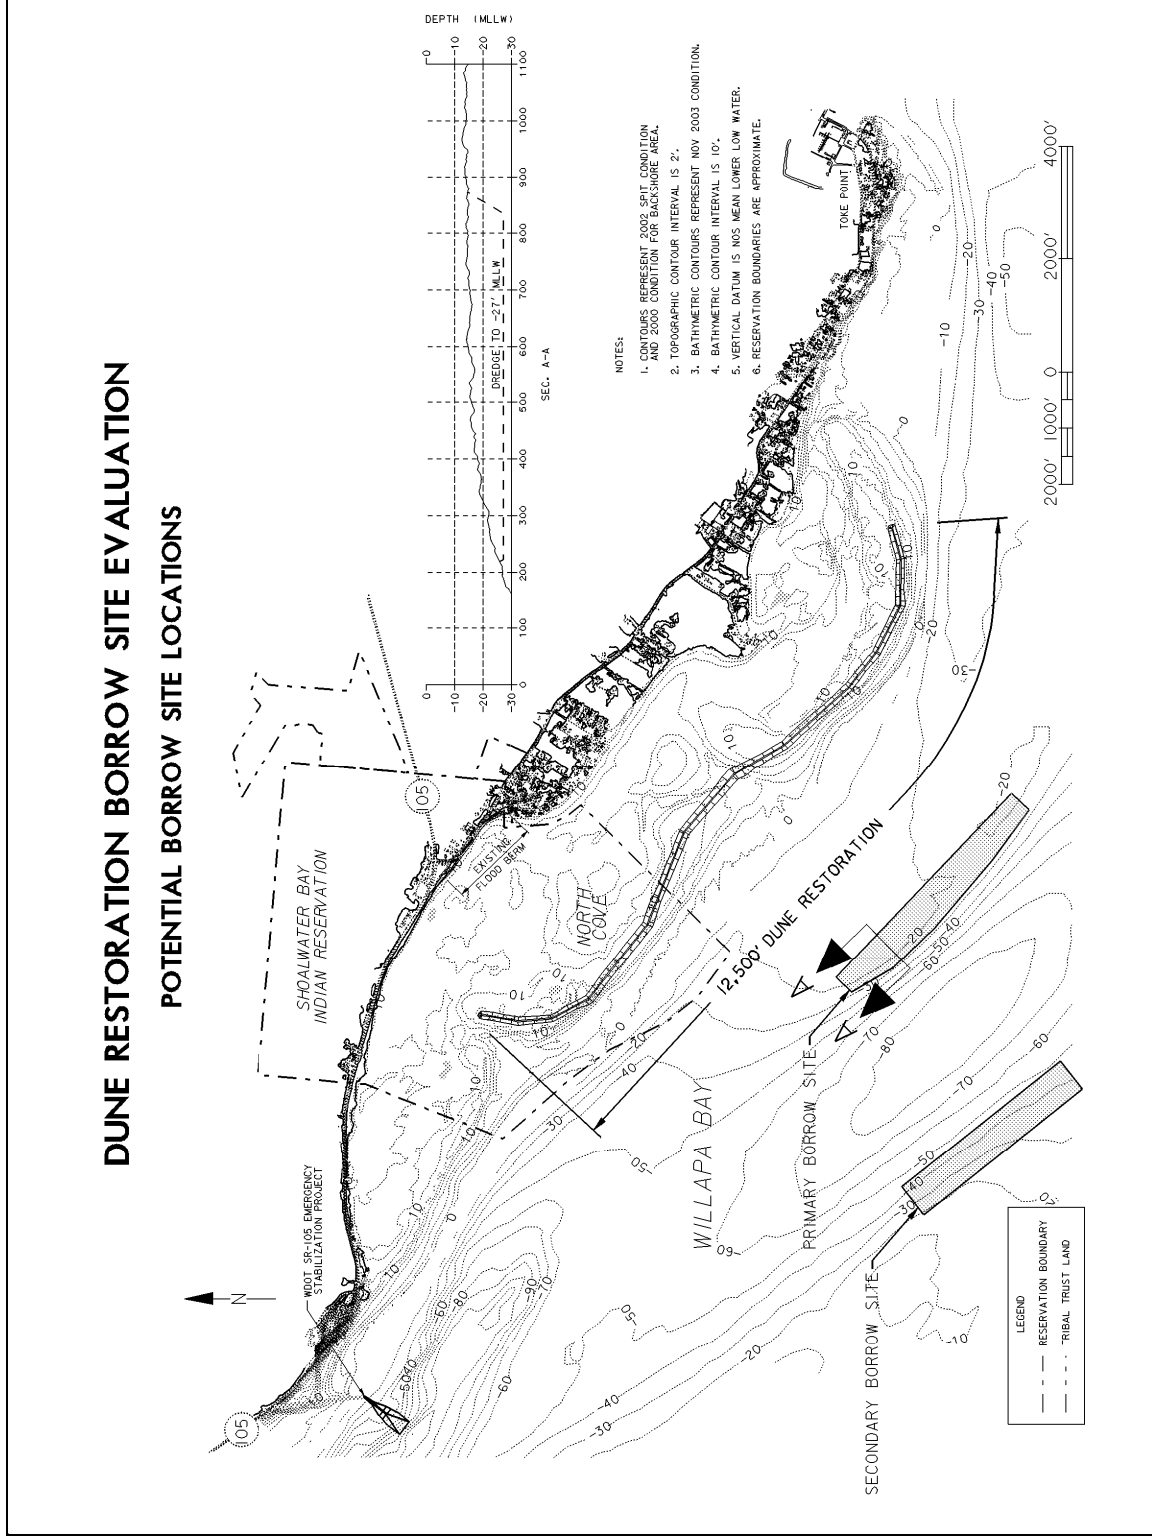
Alternative 6, Barrier Dune Restoration and Potential Borrow Sites
